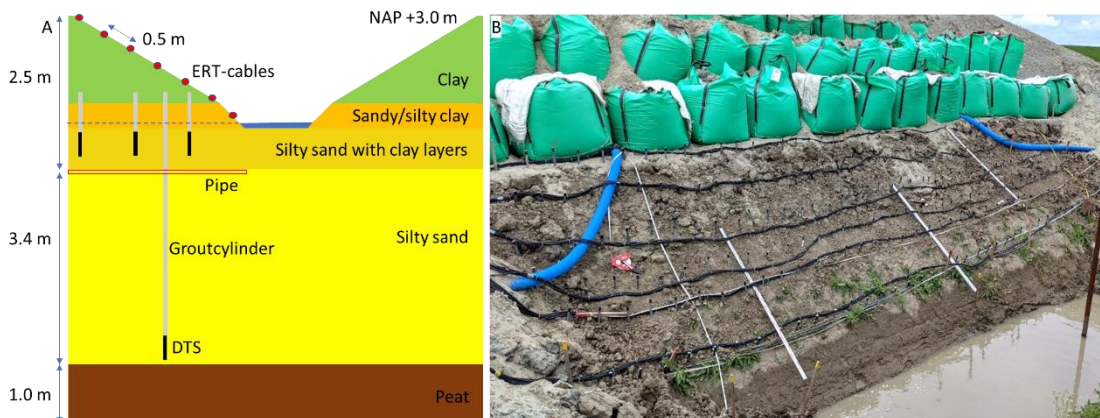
A: position of the ERT-cables along the slope in relation to the position of the ditch and the level of pipe formation. B: lay-out of the cables next to the ditch. The cables are black and the metal pins are visible along the cables.
